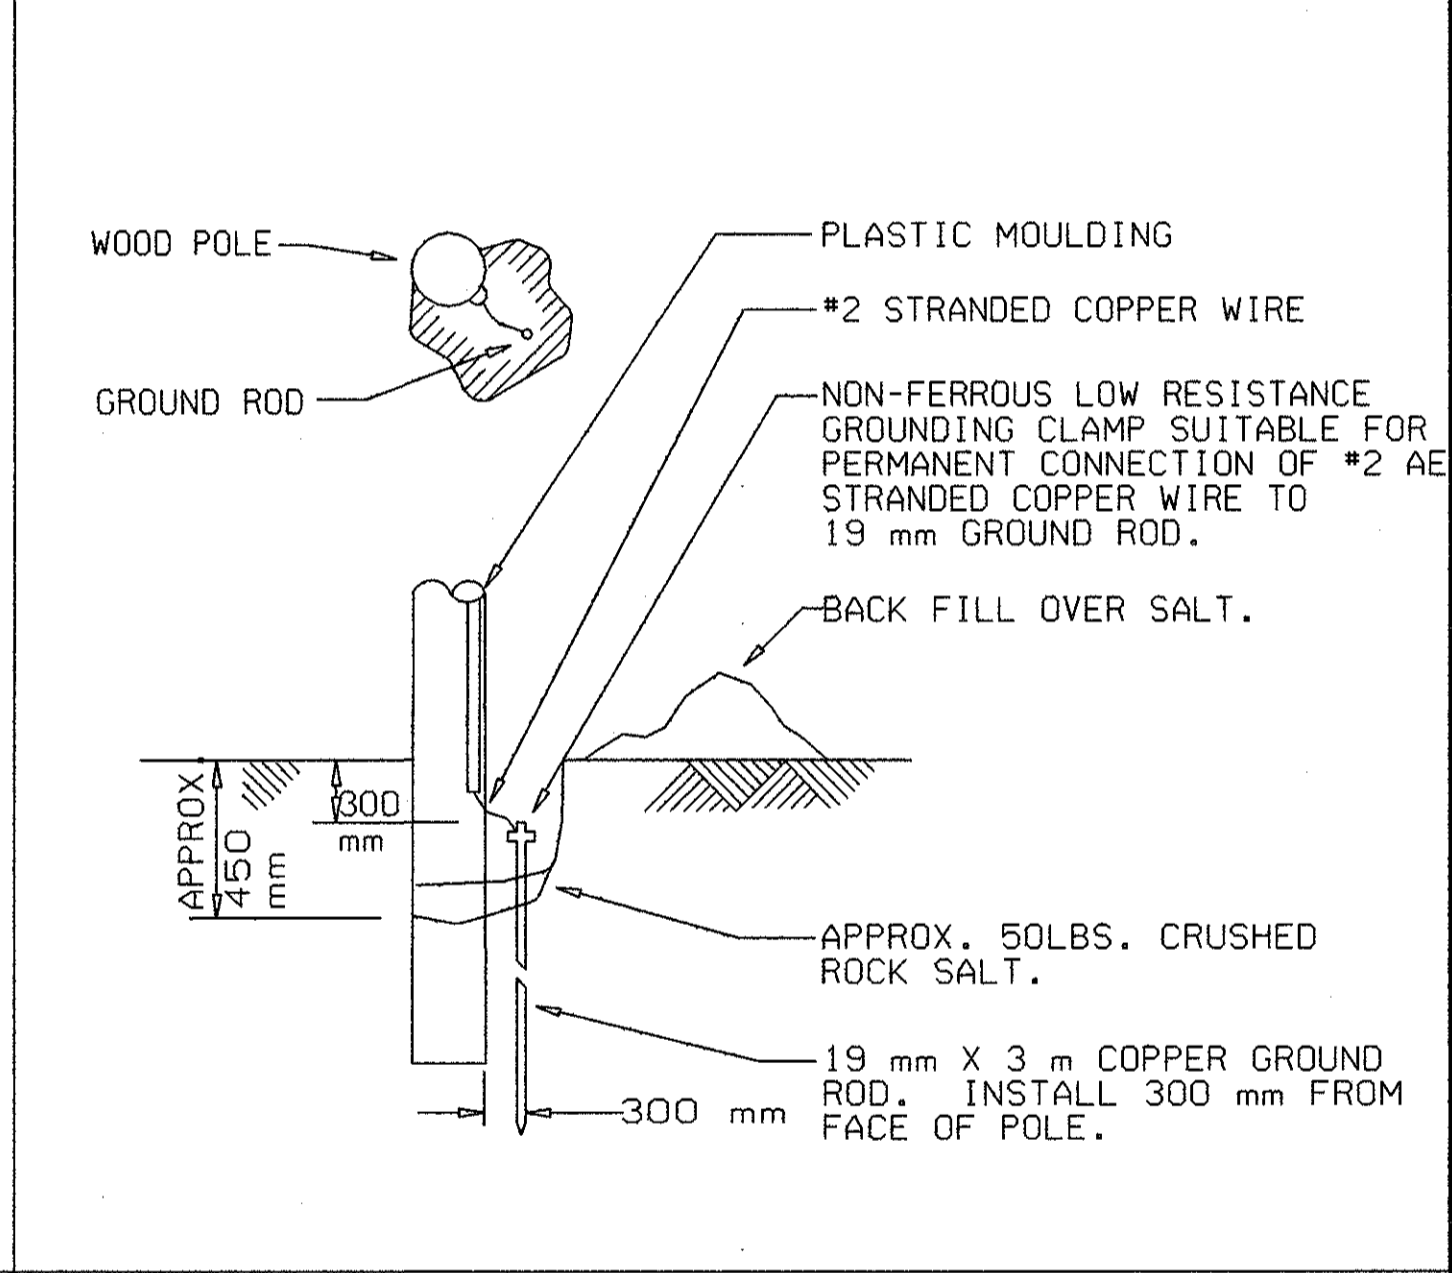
DETAIL : WOOD POLE INSTALLATION (N.T.S.)
